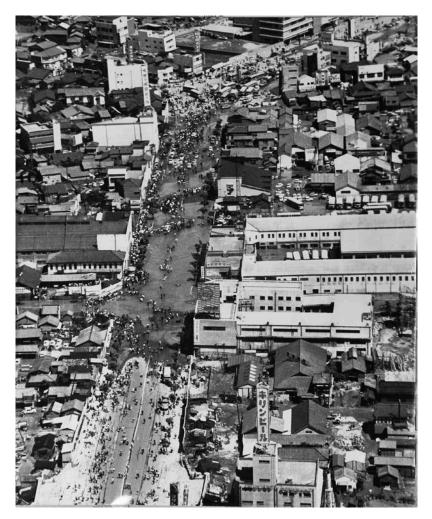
View on the south bank of the Shinano River; from the Bandai Bridge along the East Main Street, towards the Niigata Railway Station (still photo taken by Mr. Yuminamochi) 万代橋上空から新潟駅方向を望む
